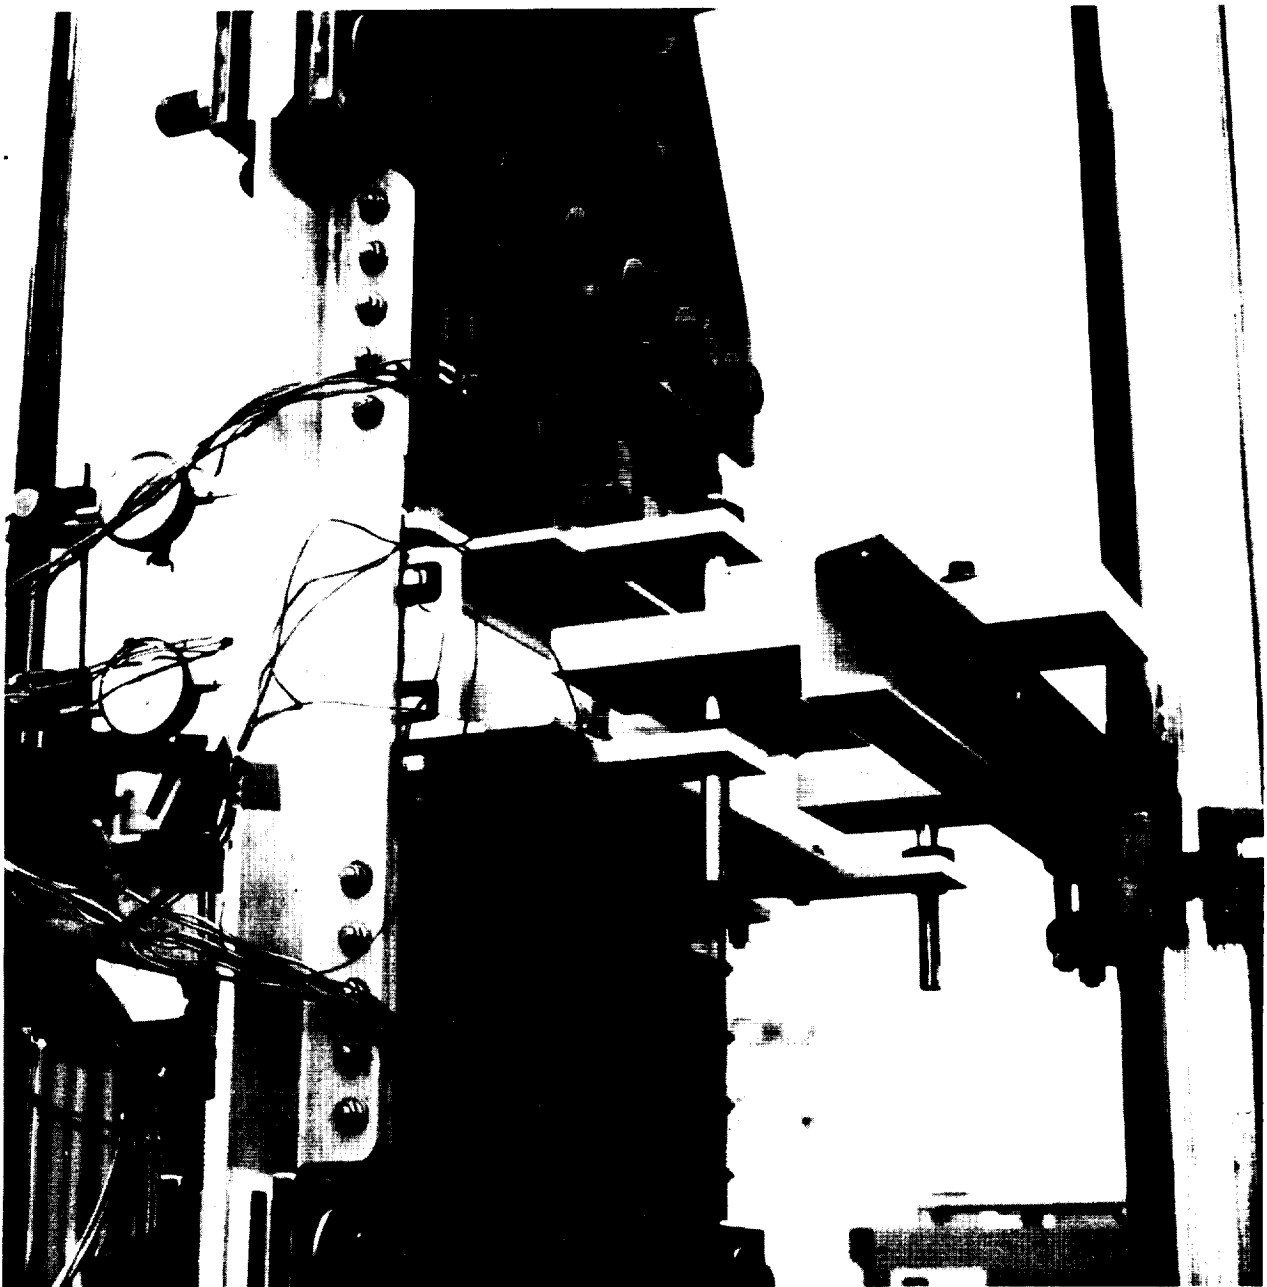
LARGE SLIDING JOINT — TEST JIG FOR TENSION
